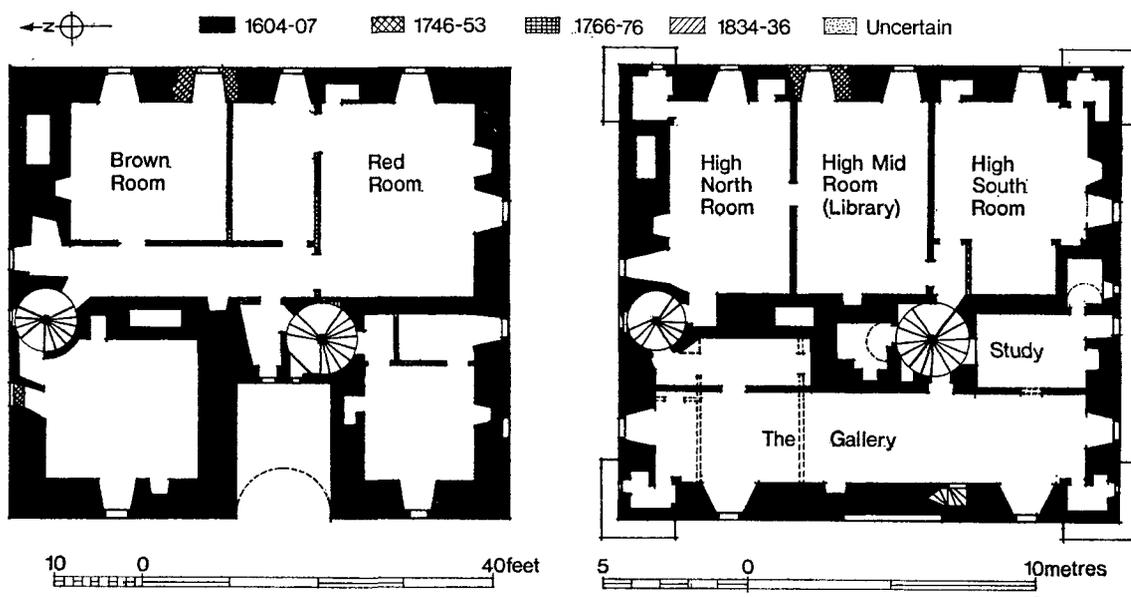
Craigston Castle: plan of second floor (left) and third floor (right), showing the Gallery as built
